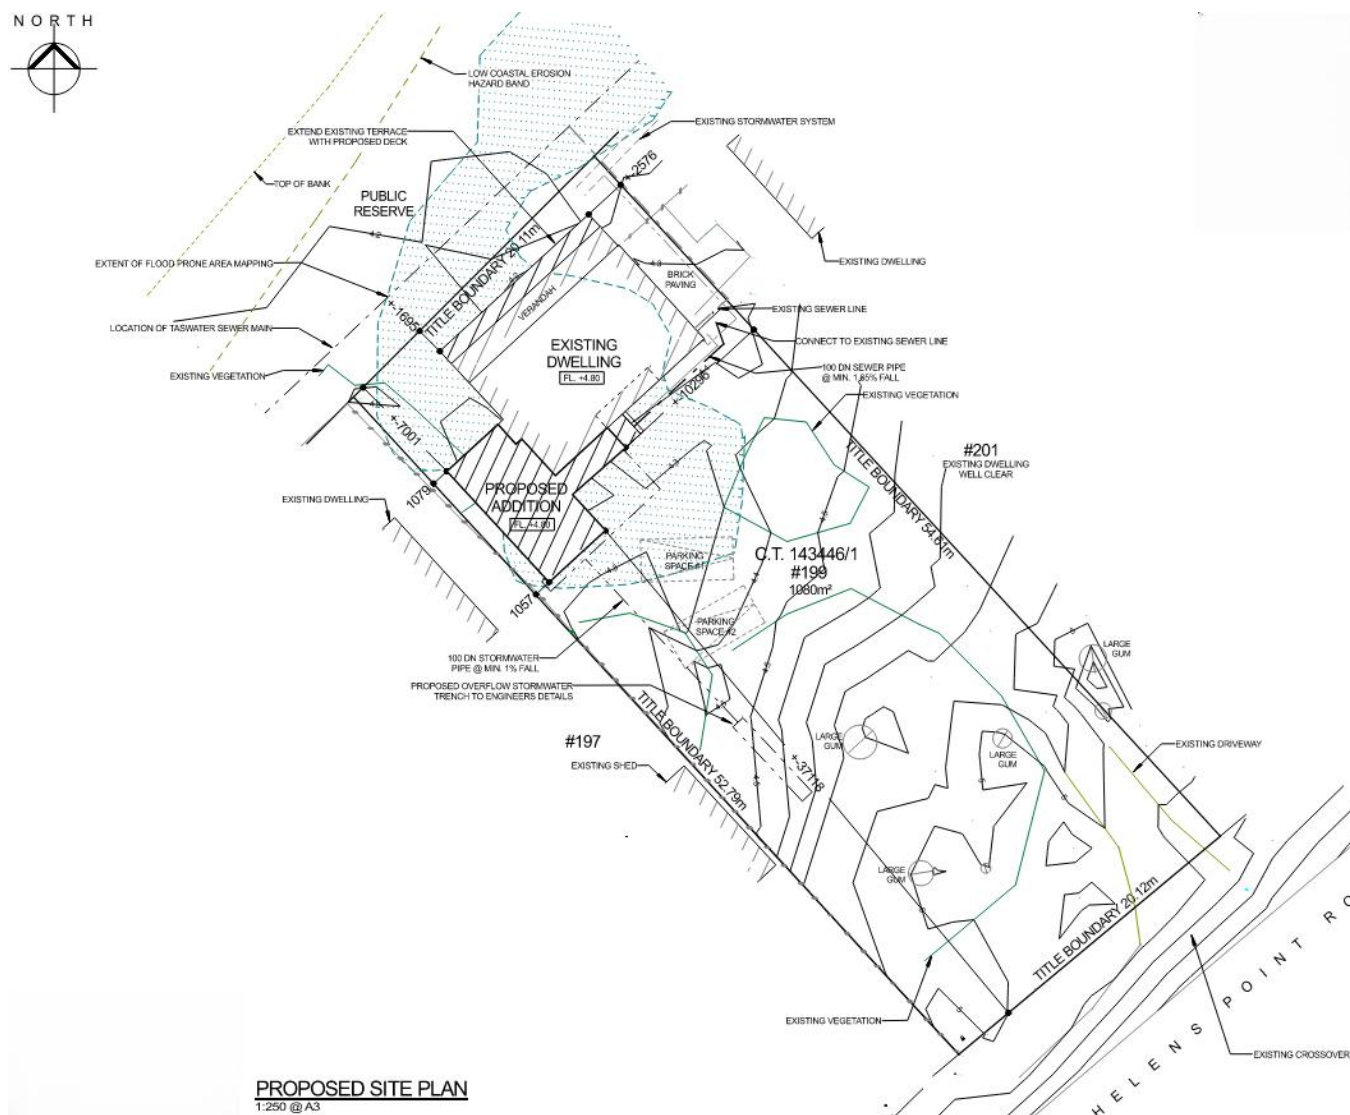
Proposed Site Plan (Jon Pugh Home Design)
